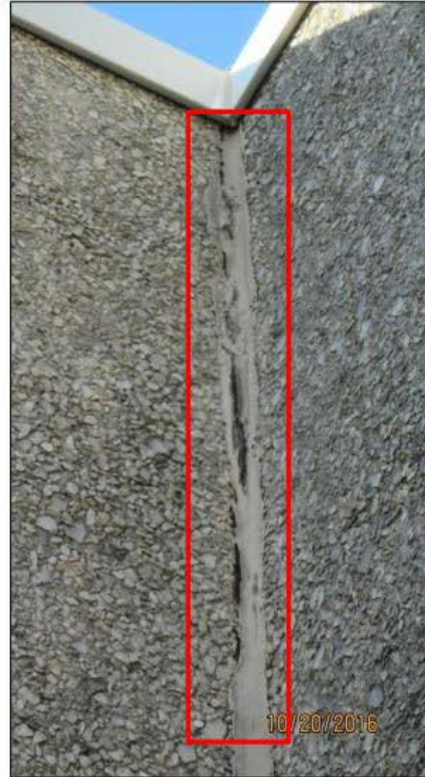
Additional image of a failed vertical precast joint, area outlined in red
